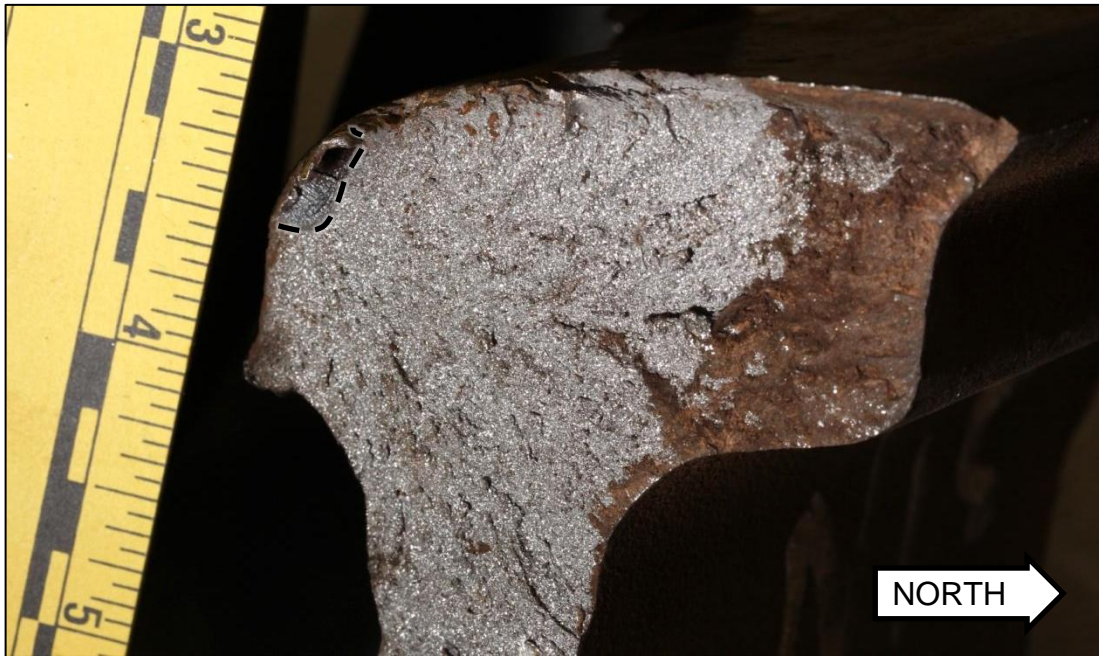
View of the fracture surface at the east end of piece N15B. A dashed line indicates the boundary of a detail fracture emanating from the gage corner.
